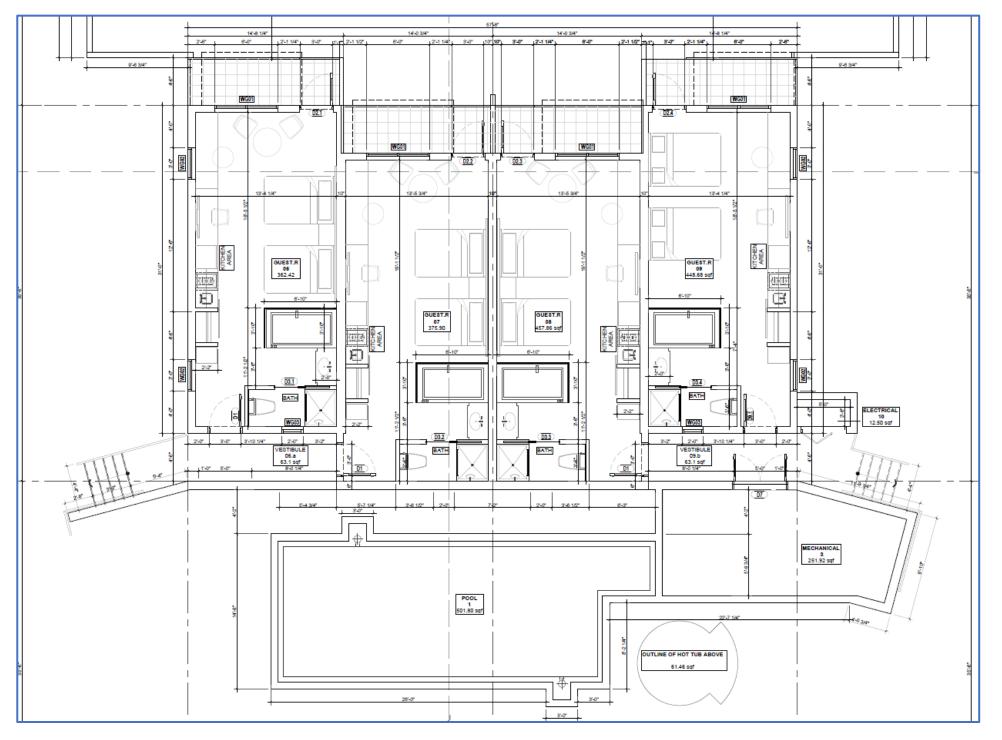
Upper floor of the Centre wing in the *Proposed Development* (refer to Building 2 in Figure 3 for a 3D rendering of the structures). This floor will house guest rooms and an outdoor pool. *Image modified from HNPA Architecture+Planning Inc by Coastal Raintree Consulting, Ltd.
